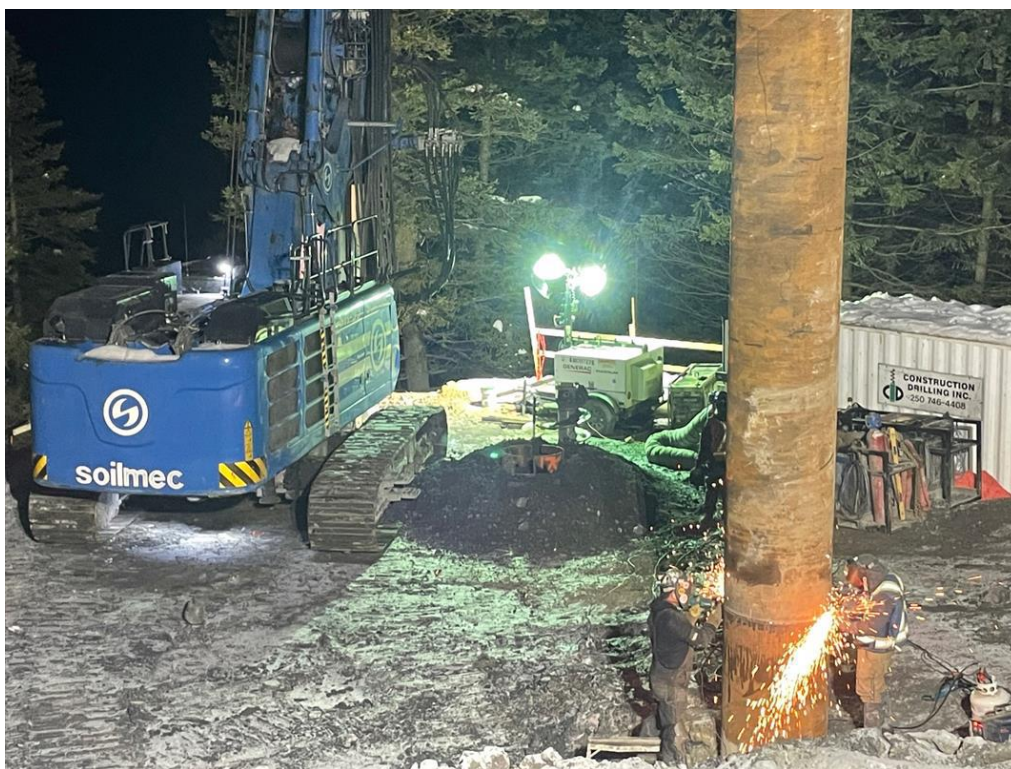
Blackwall Bridge – Micro pile installation completed – Feb. 22, 2022
